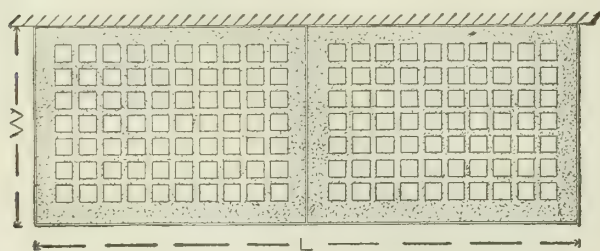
DETAILS SHOWING CONSTRUCTION OF CAST IRON SIDEWALK LIGHTS, CONCRETE SETTING
